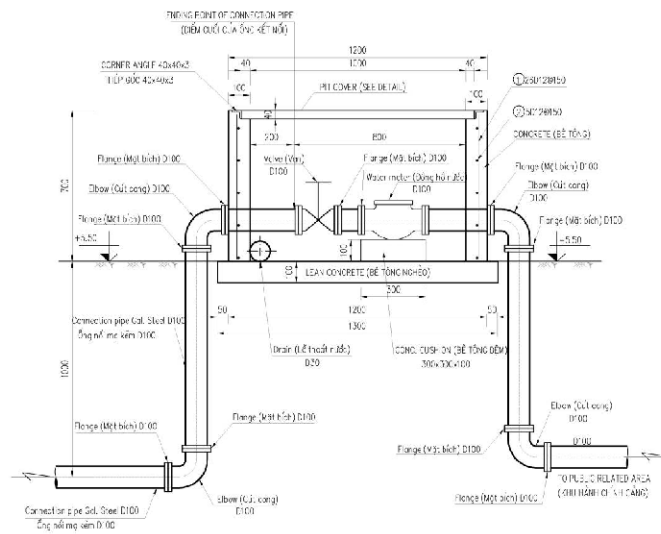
Detail of Connection Pit between Main Pipe and Water Supply Pipe in the Public Related Area
